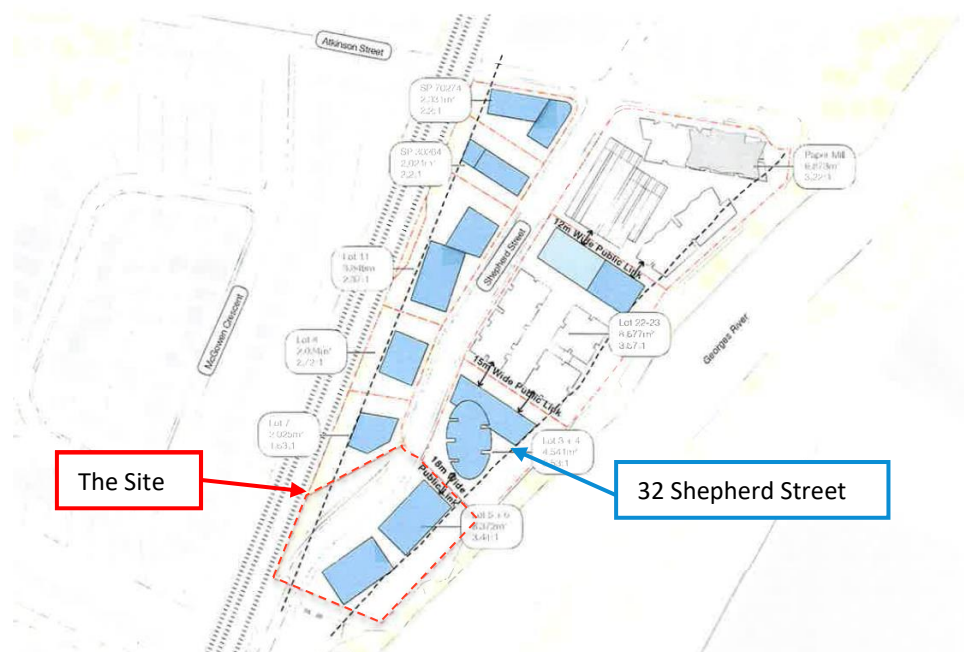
Extract of Section 4.3 Preferred Concept – Plan of Shepherd Street Precinct masterplan
